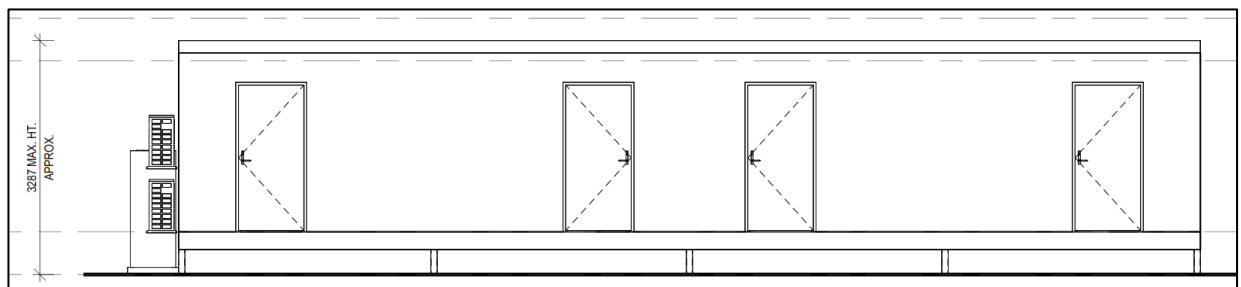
Accommodation Module Elevation (Source: The Design House NQ, 2026)
